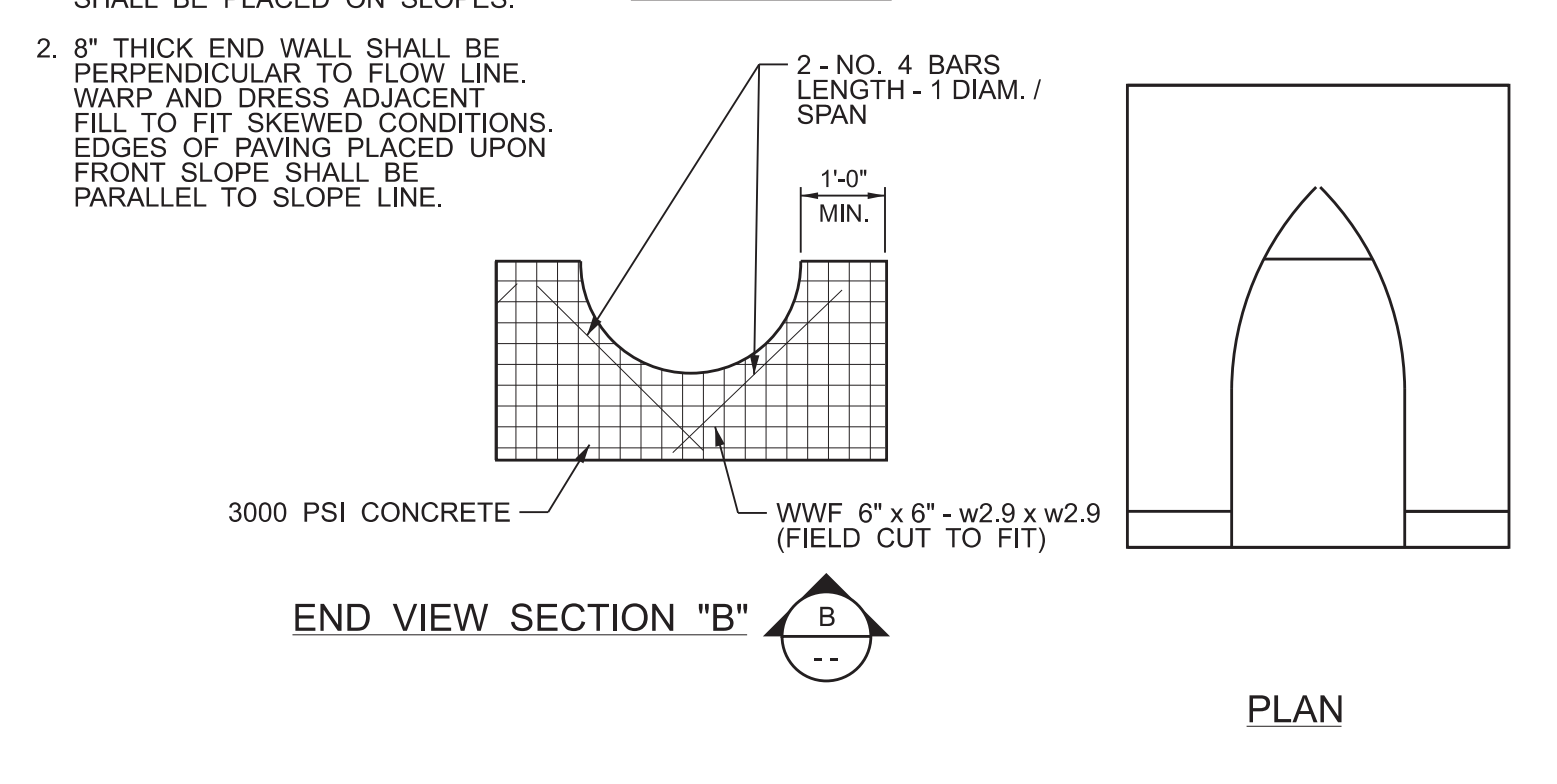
DETAIL - HEADWALL WITH ENERGY DISSIPATOR
